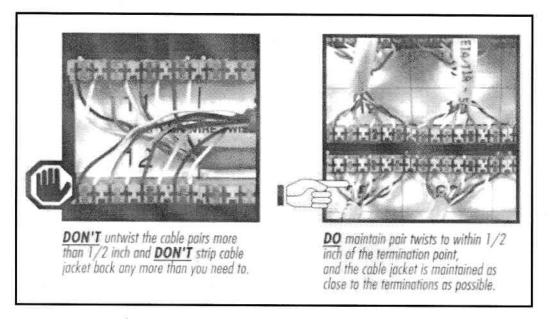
Detail Photos of Patch Panel Termination Practices.
